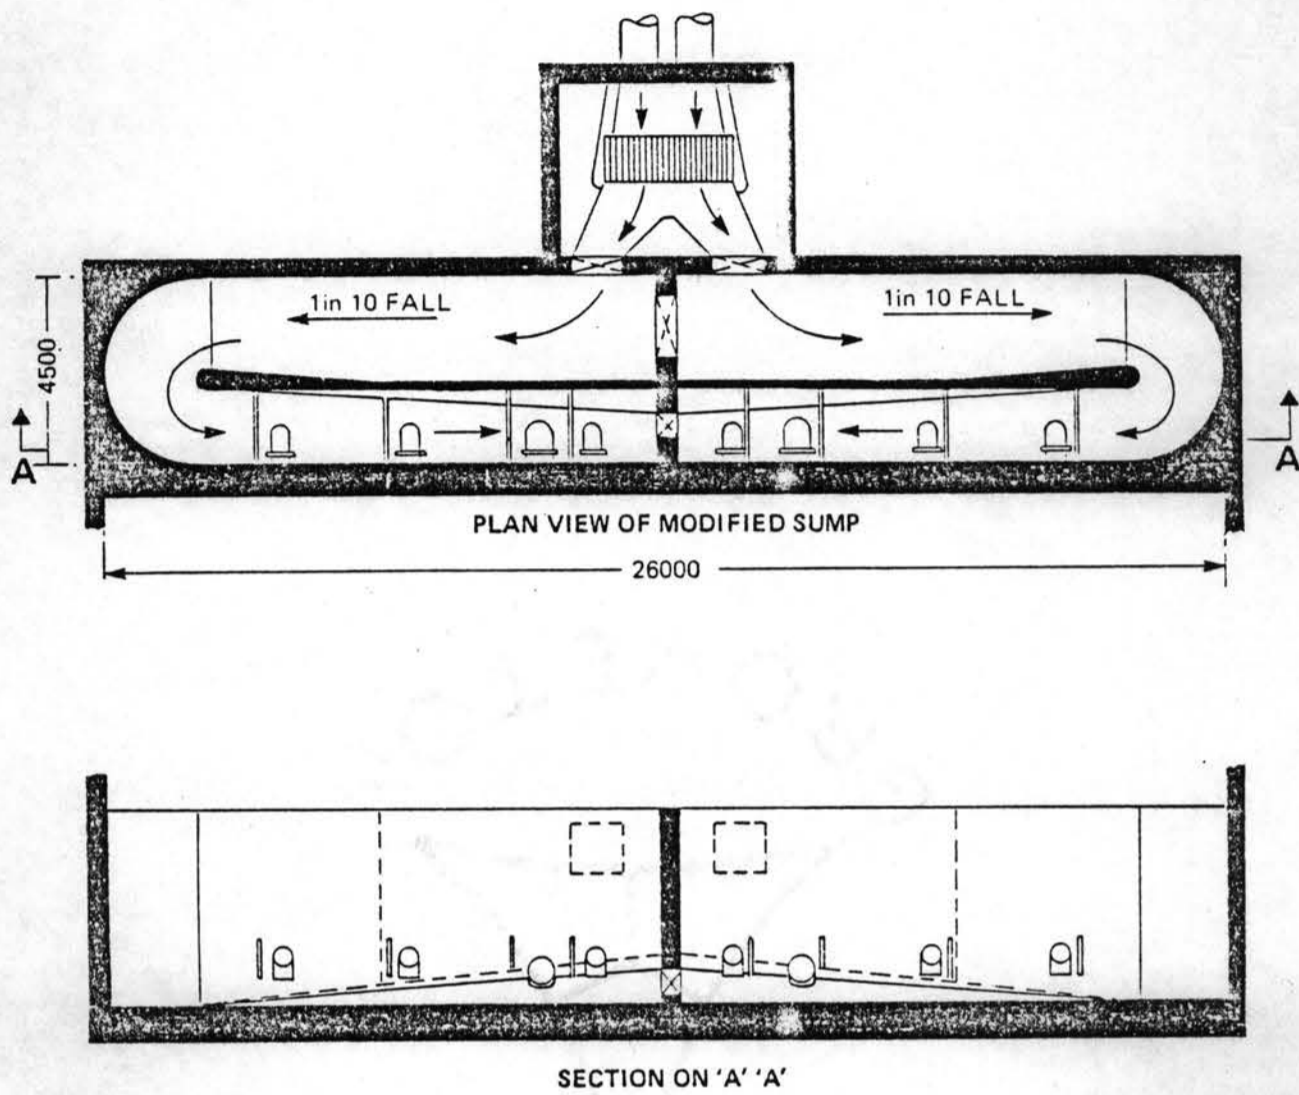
FINAL LAYOUT OF SEWAGE SUMP
